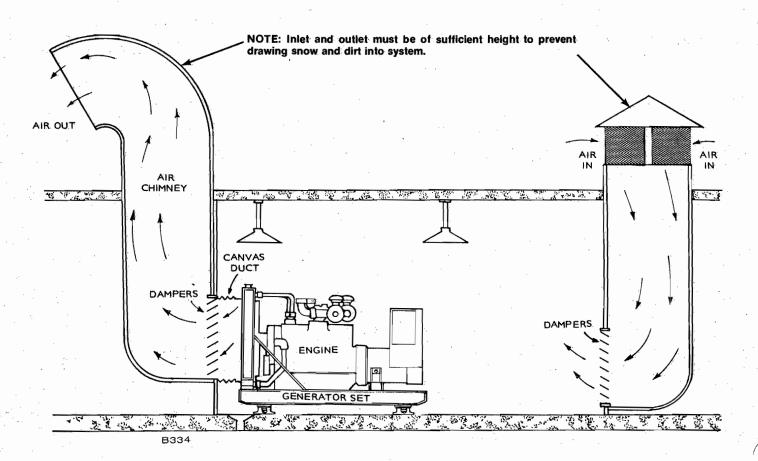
TYPICAL DUCT INSTALLATION WITH ROOFTOP AIR INLET AND OUTLET
